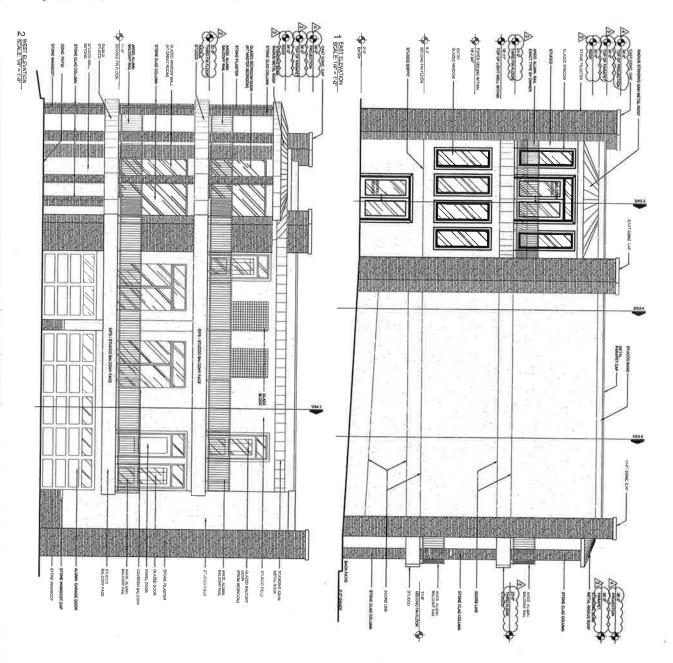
" - Conceptual Wall / Fence Diagrams (West Elevation)
